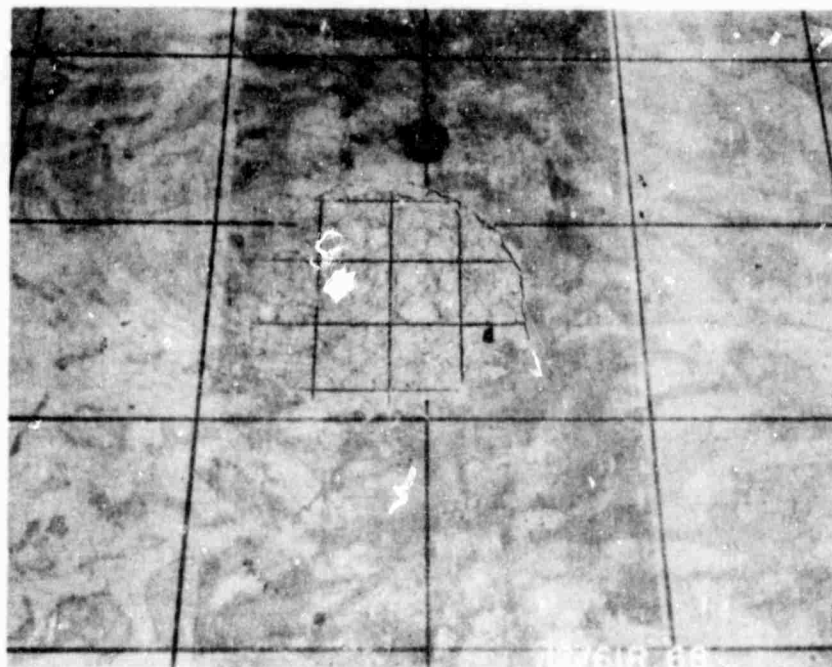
Close-up view of a failed area on a prestressed model pavement. (Crushed surface concrete was removed exposing the prestressing steel tendons.)
